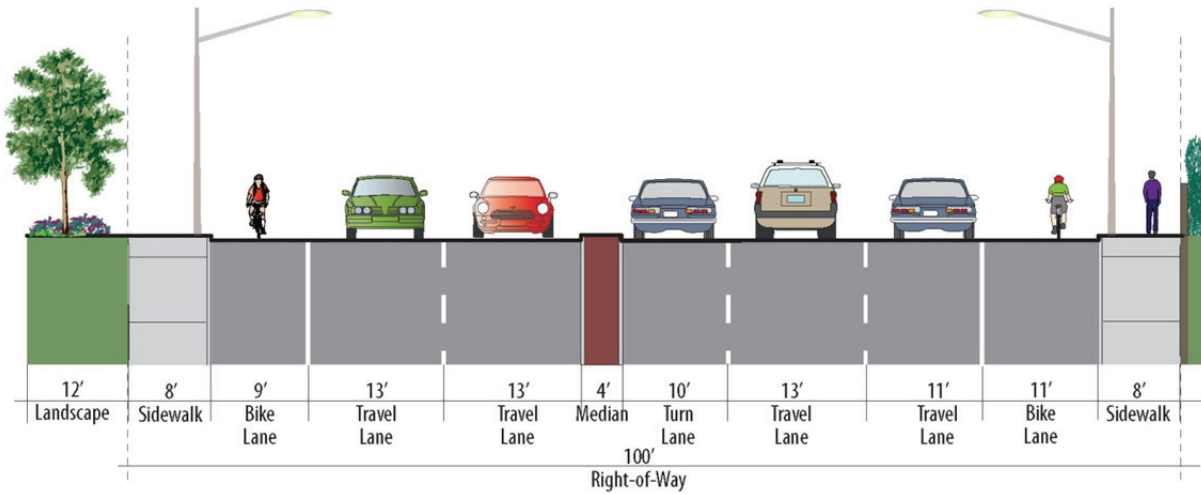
Proposed Bikeway Improvements, Section B – Kanan Road Intersection
